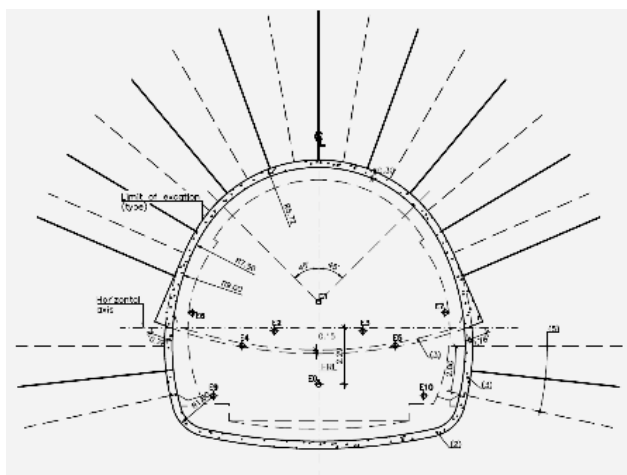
Tunnel 1 – Main Tunnel. Typical primary support.
